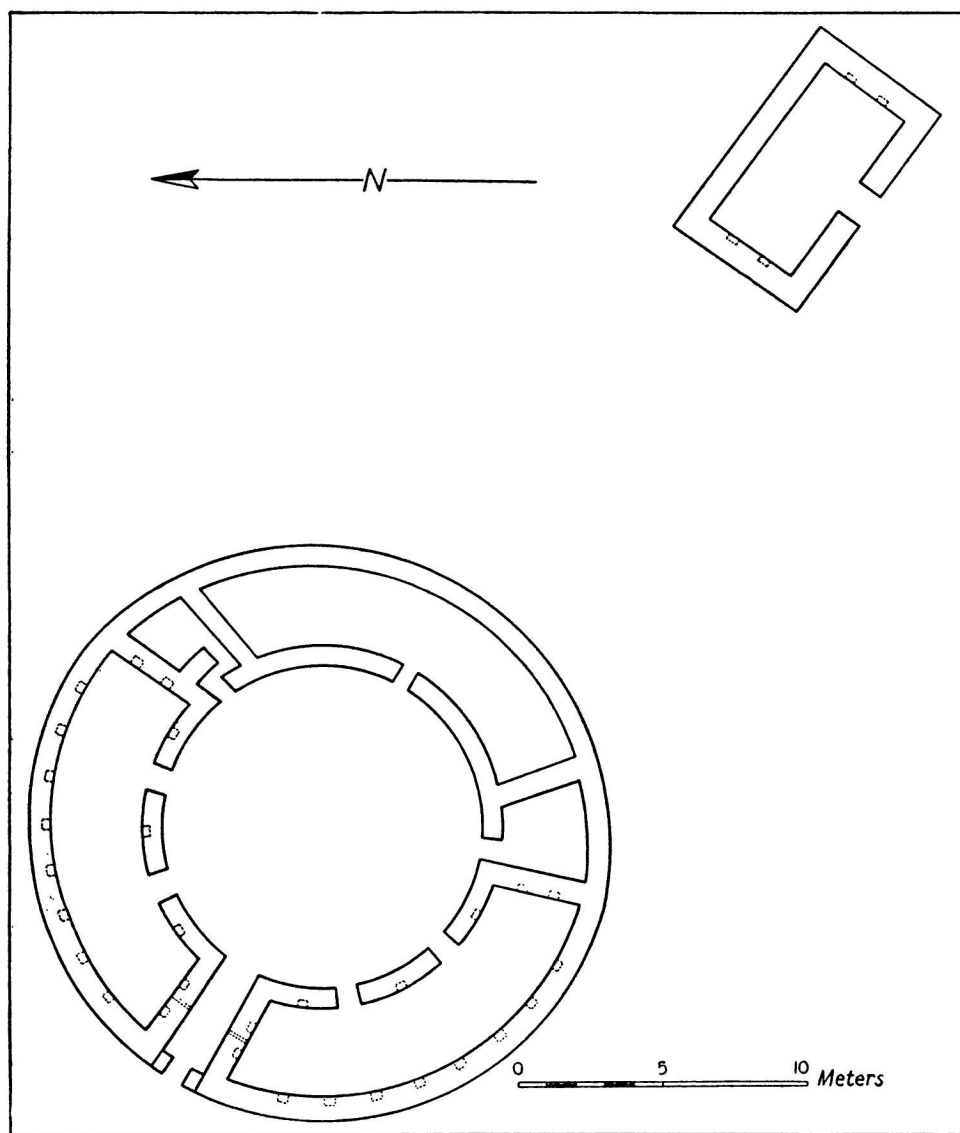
PLAN OF THE RUIN OF RUNCU RACCAY
